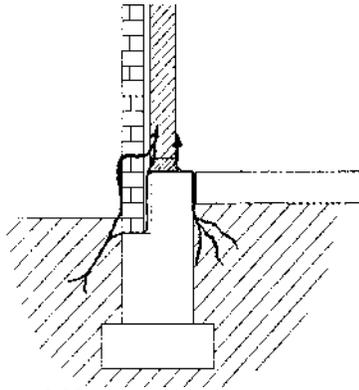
Poured foundation—brick veneer (arrows indicate possible termite entry points).
